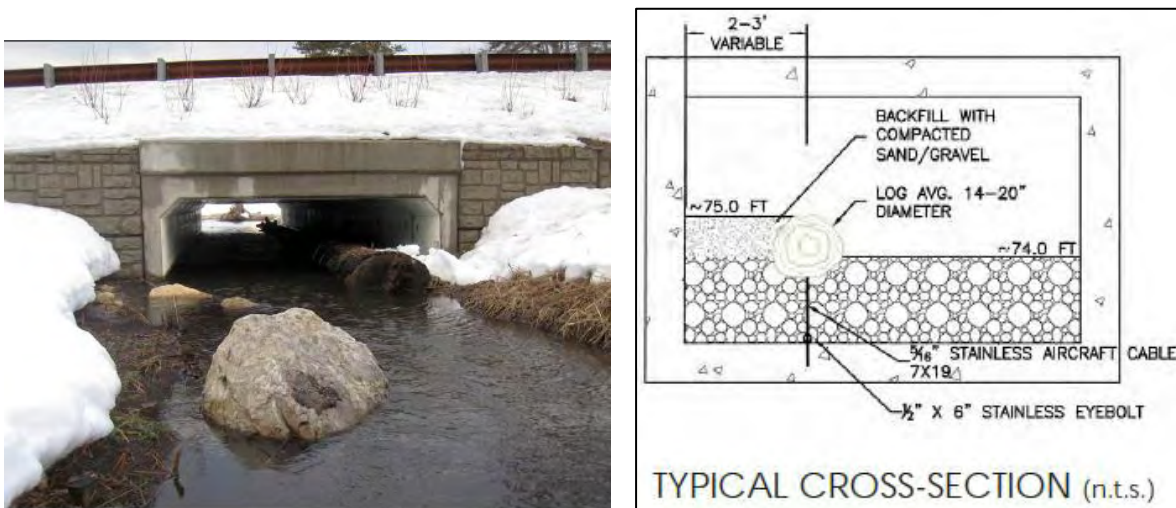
An example of a concrete box culvert with natural channel substrate on the bottom and a floodplain bench built for terrestrial organism passage.
